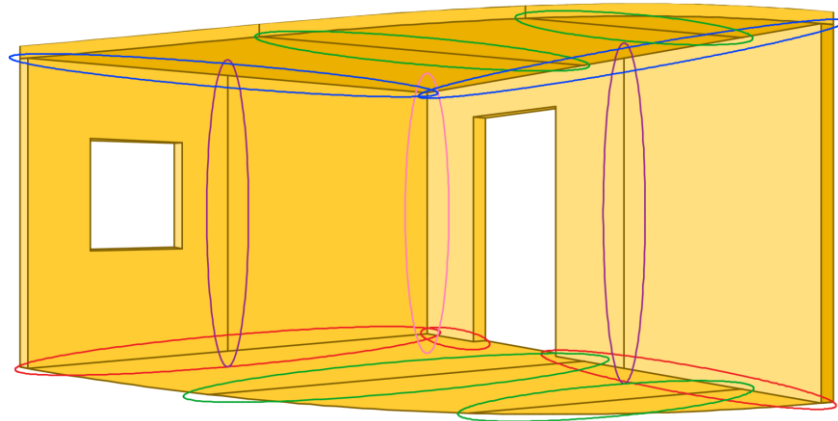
Type of connections in CLT structures: wall-to-lower diaphragm / wall-to-foundation (red line), panel-to-panel in a wall (purple line), wall-to-wall (pink line), wall-to-upper diaphragm (blue line), panel-to-panel in a diaphragm (green line).
